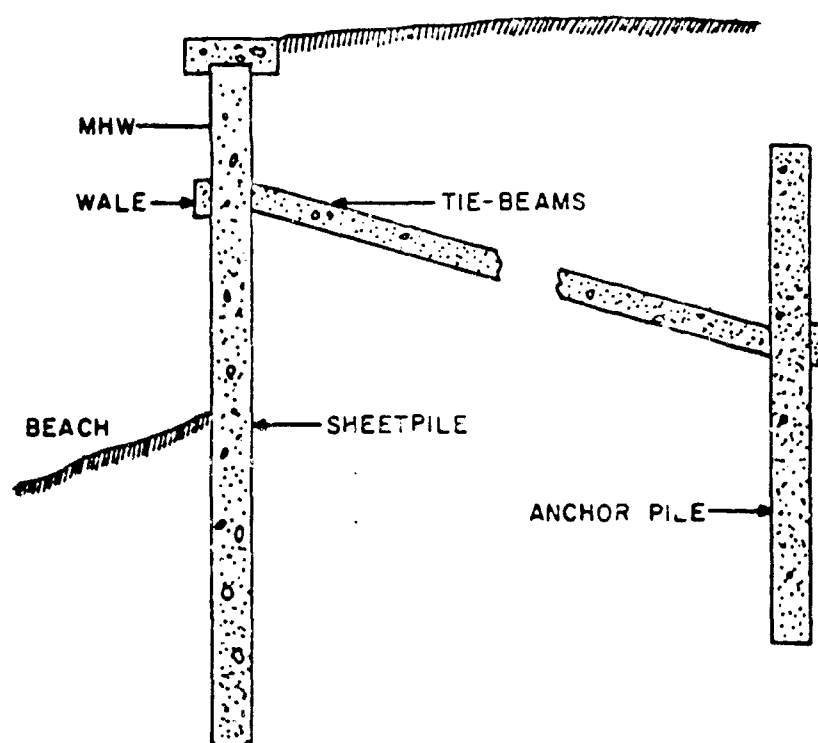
FIGURE II - SECTION OF TYPICAL PRESTRESSED
